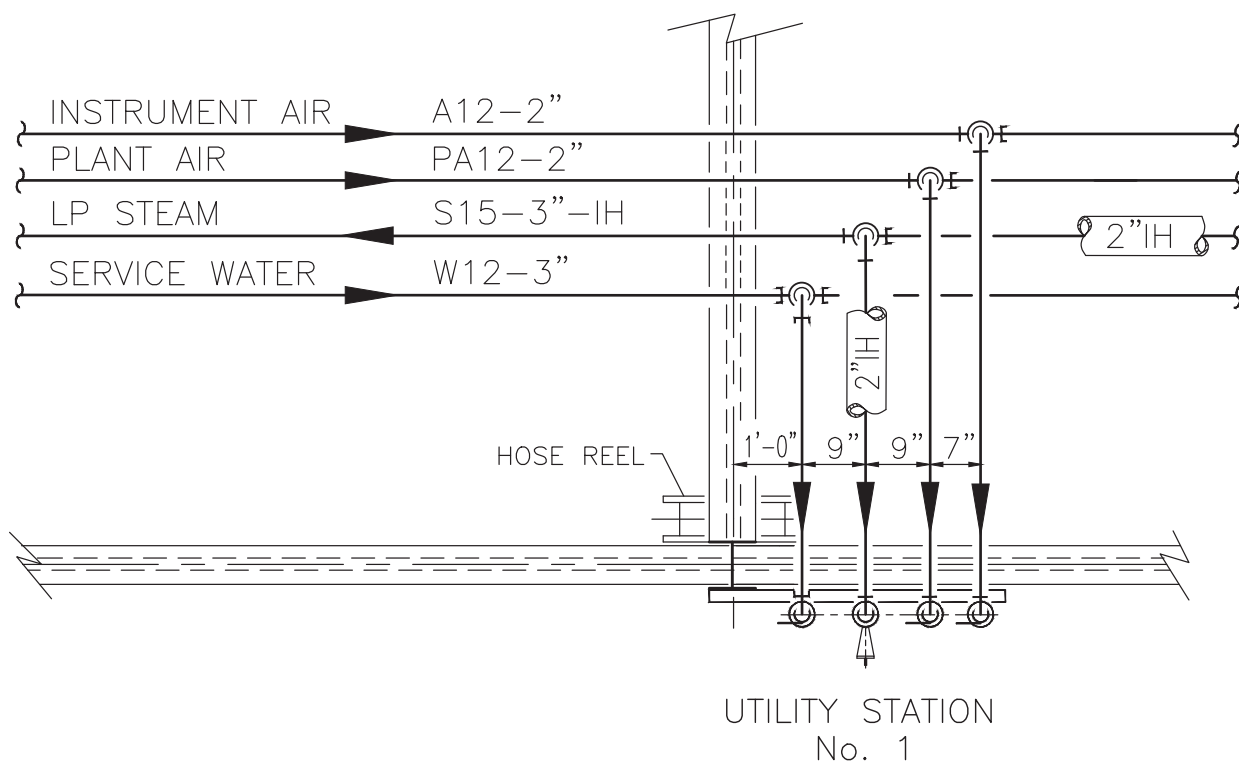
Utility station on Piping Arrangement drawing.
